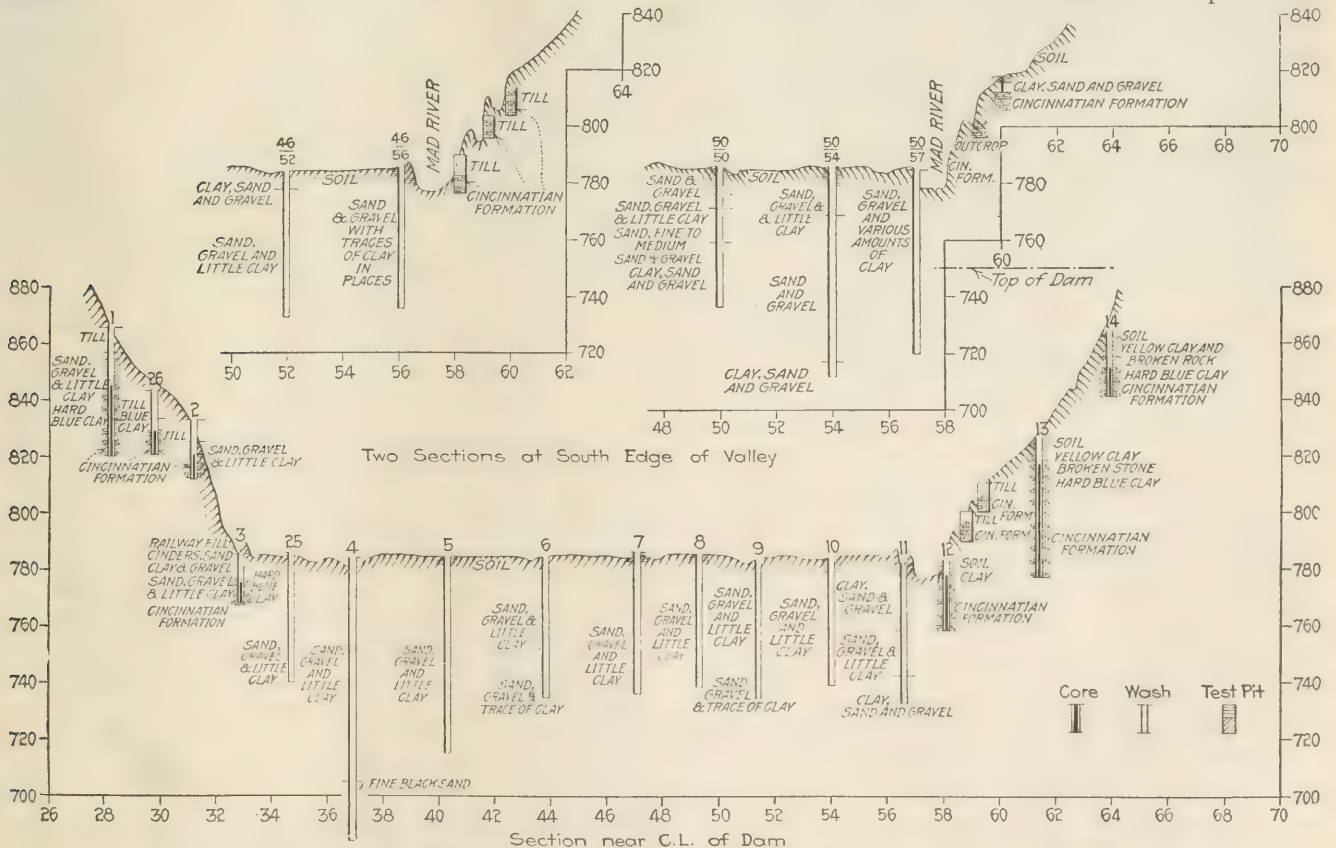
SECTION OF MAD RIVER VALLEY AT HUFFMAN DAM SITE
